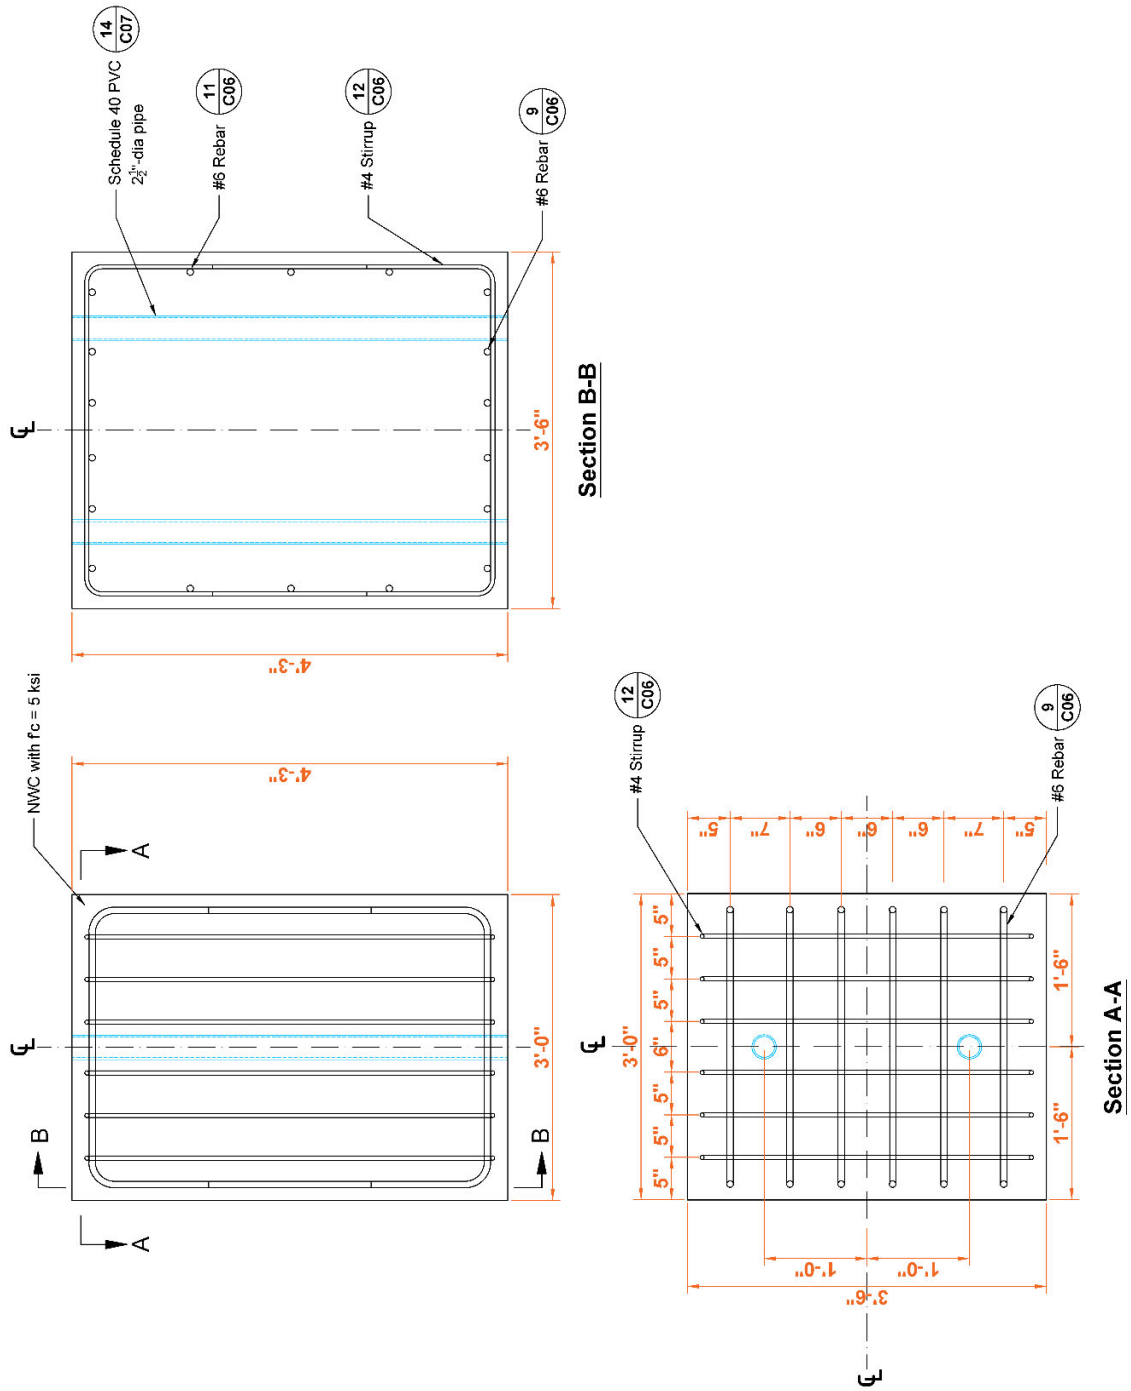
RC Footing 3 for Columns S4 and N4 (DWG C03)
